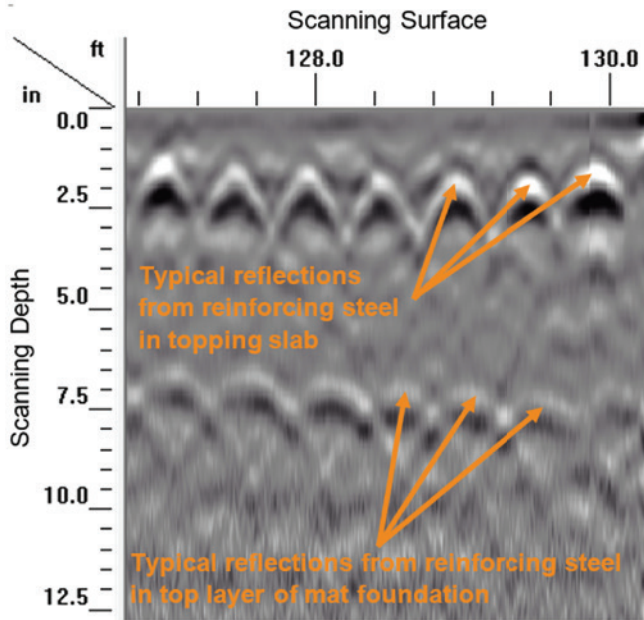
Typical GPR line scan indicating reinforcing steel within the topping slab and mat foundation.
